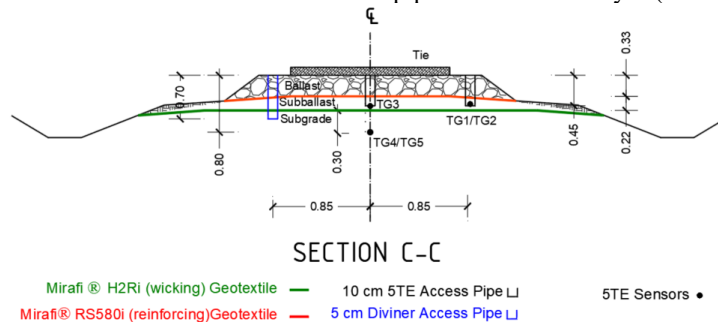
Cross-section of remediated section (dimensions in meters).
